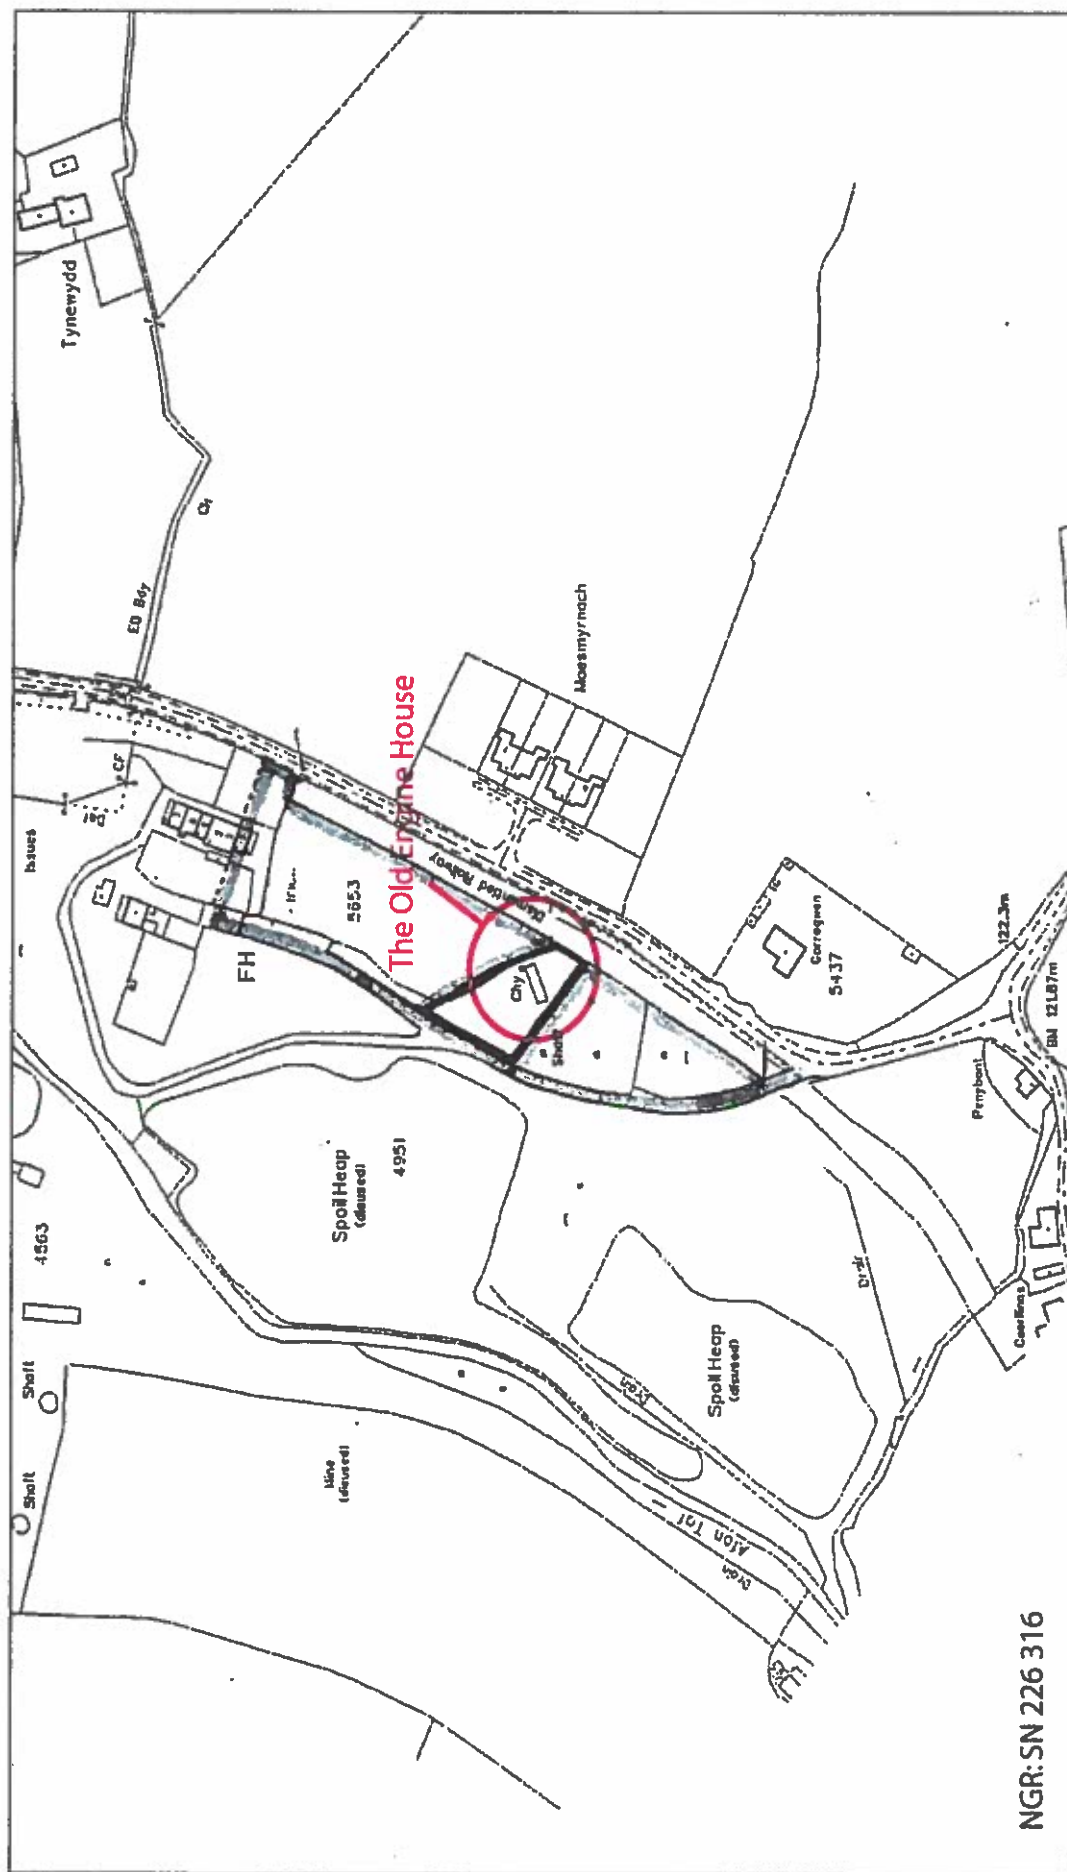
Location Plan of The Old Engine House, Llanfymach.
